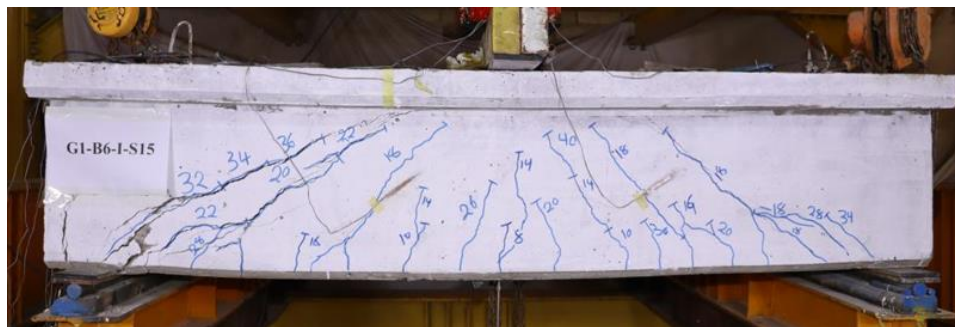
Failure crack pattern of specimen G1-B6-I-S15
